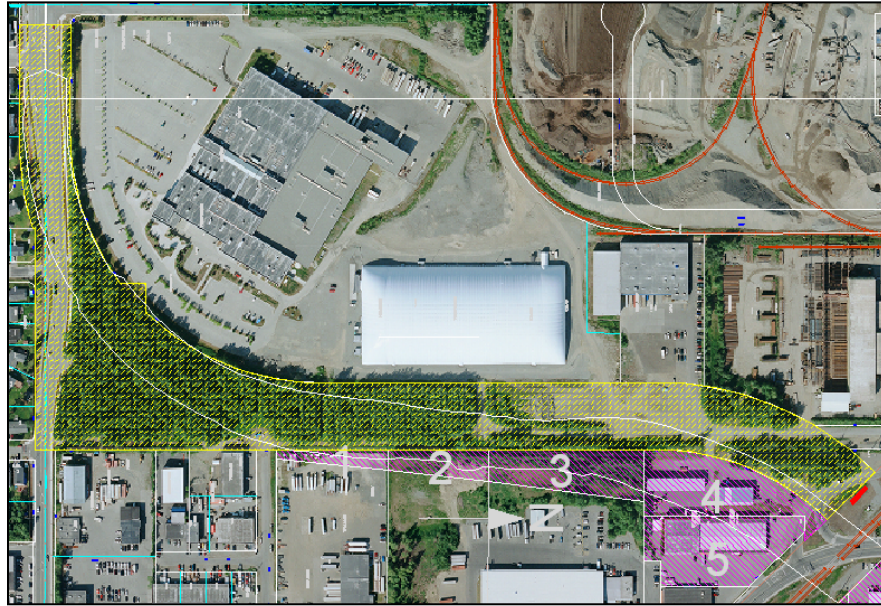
Existing ROW and Proposed Acquisition West of Arctic Blvd.
